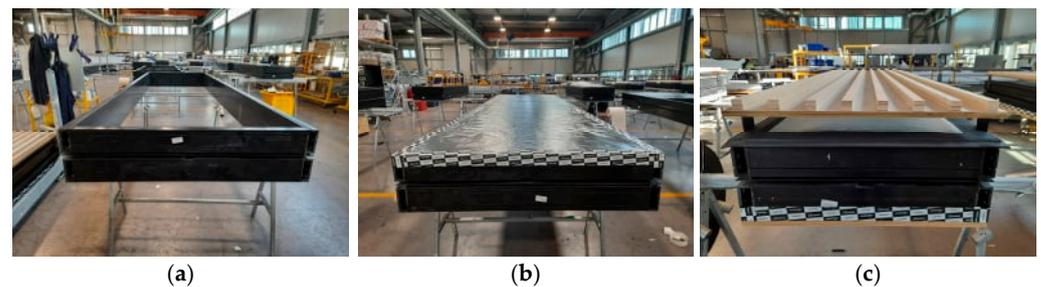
Opaque façade module prototype manufacturing: biocomposite profile frame assembly (a); membrane and tape positioning (b); and cladding installation (c).
